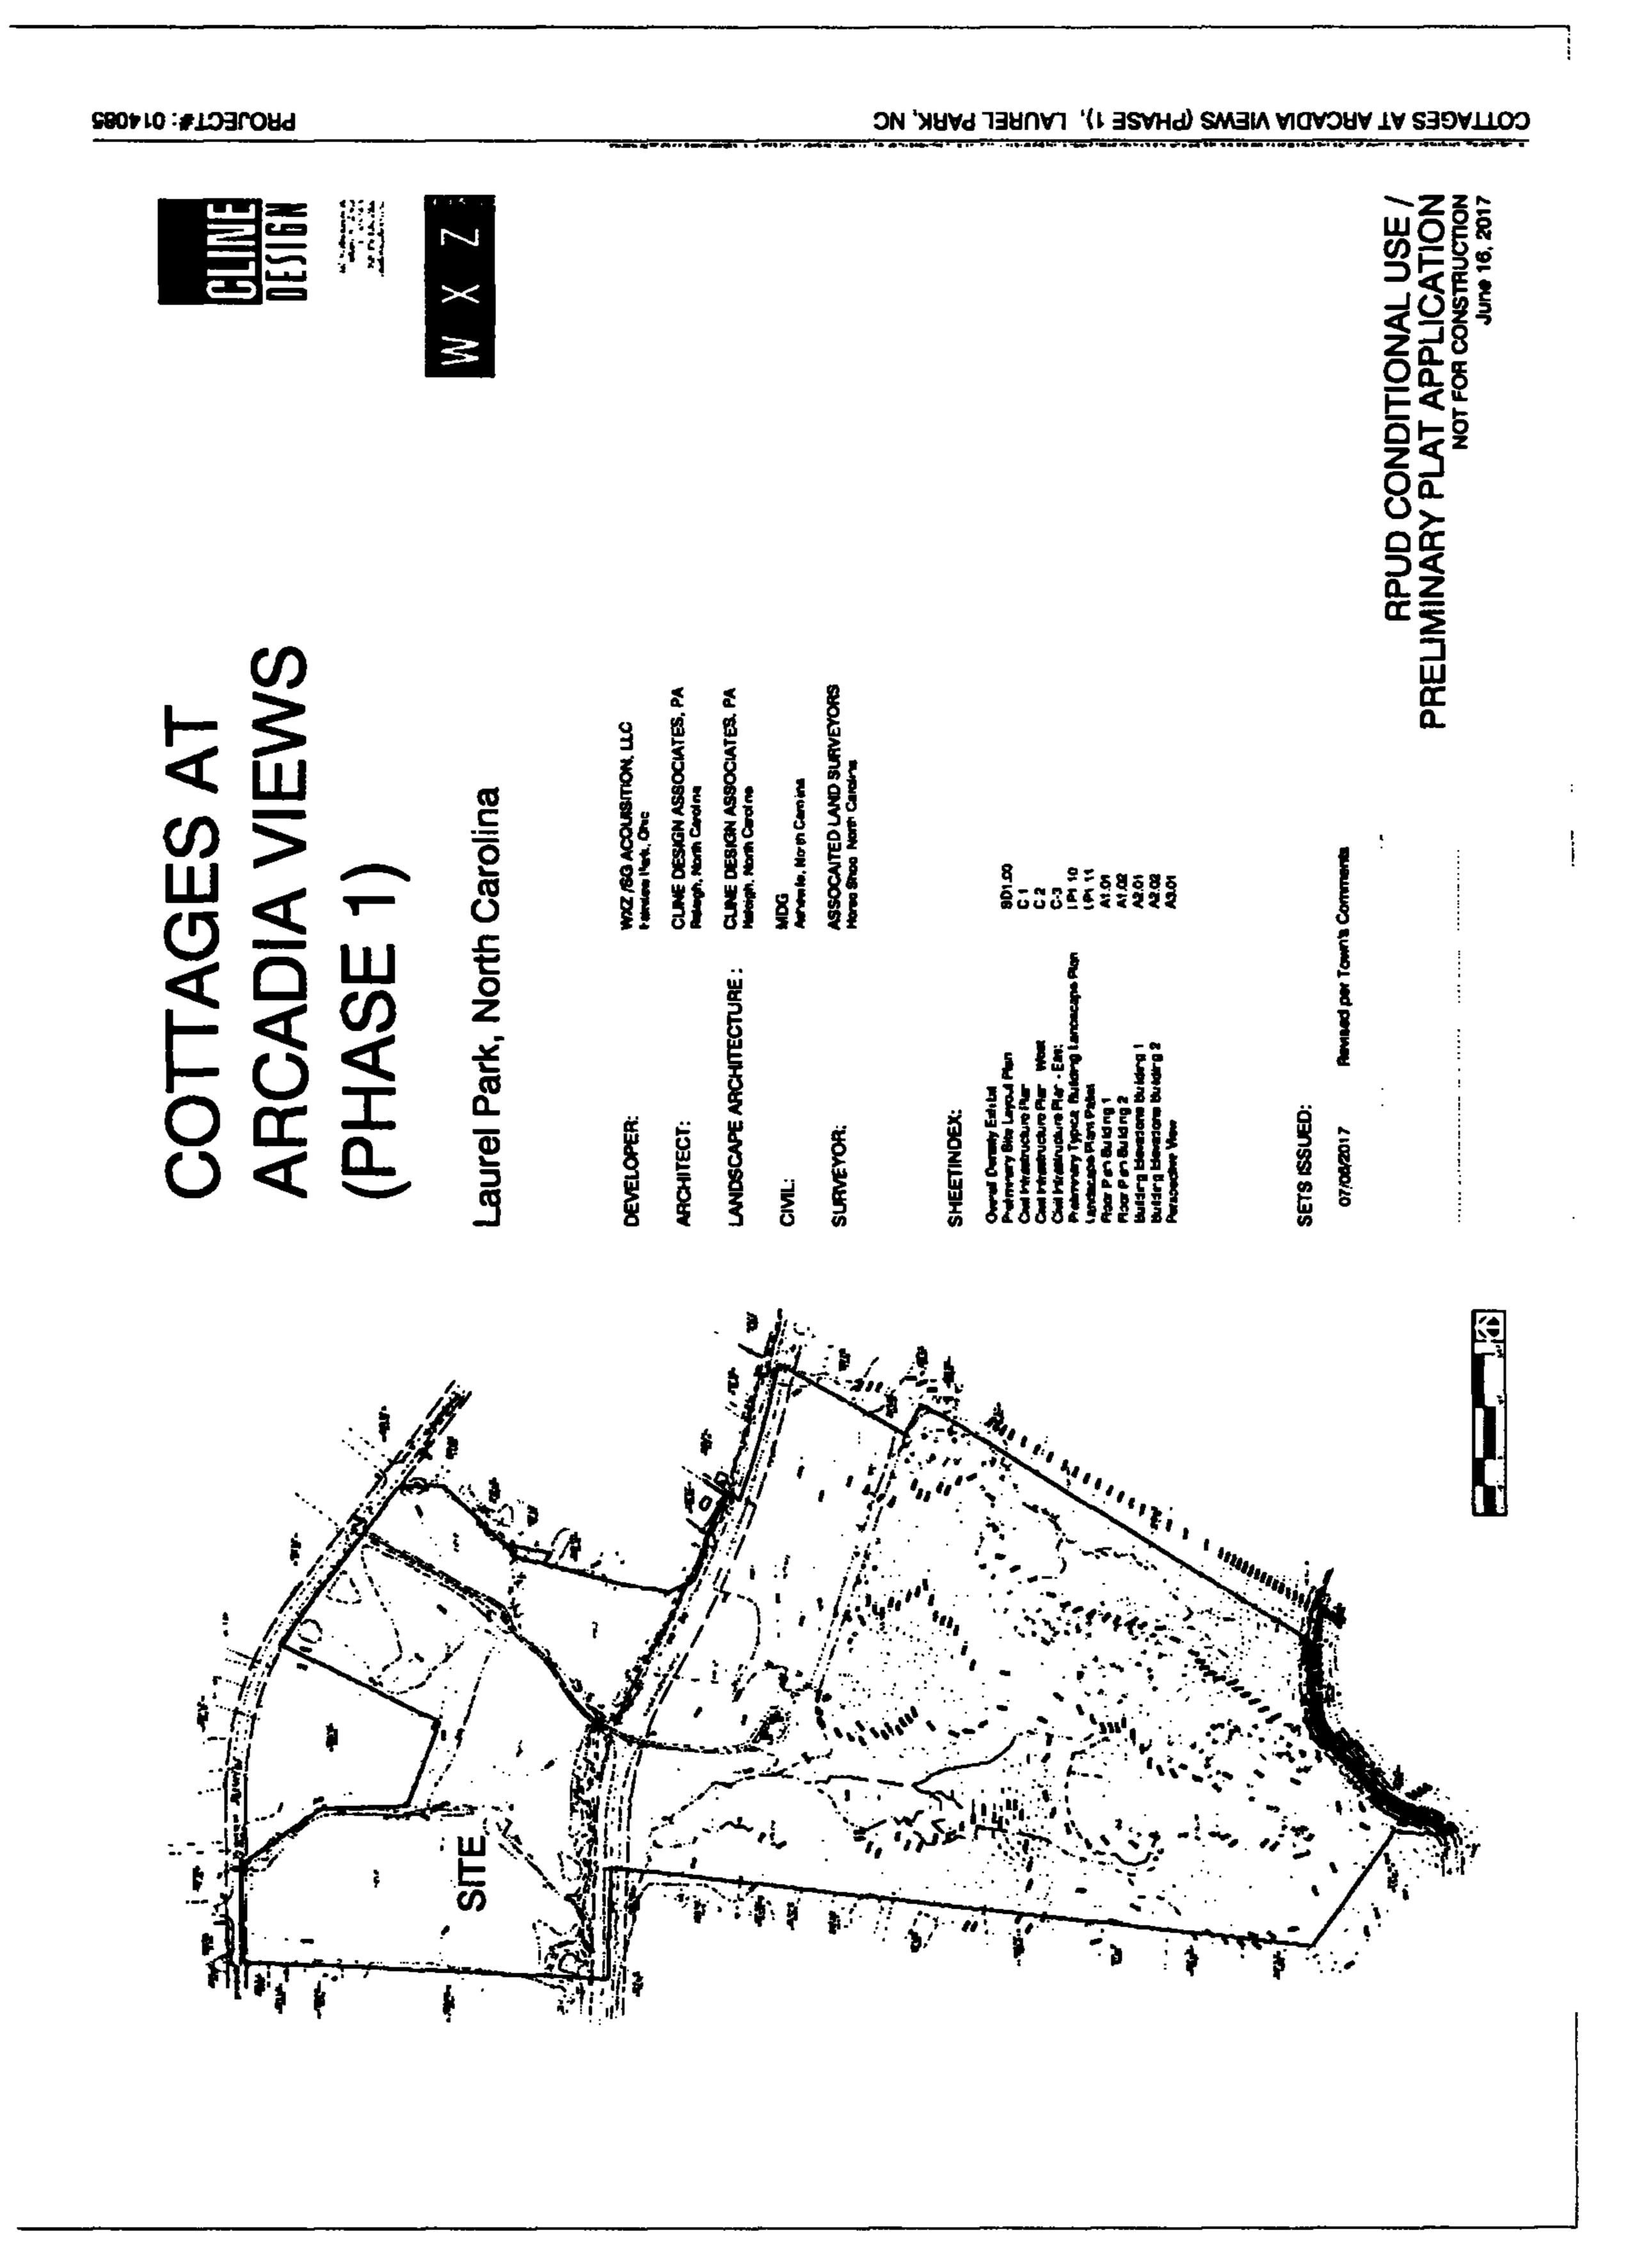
EXHIBIT B: APPROVED PLANS AND DRAWINGS
